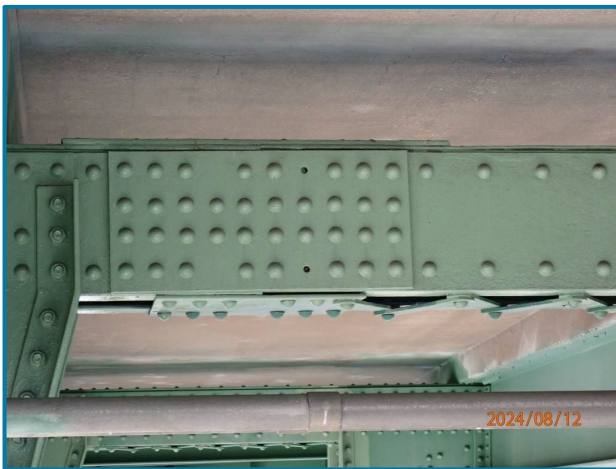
Misdrilled holes in the splice plate (U9U10 of the Center Truss, Span 10).
